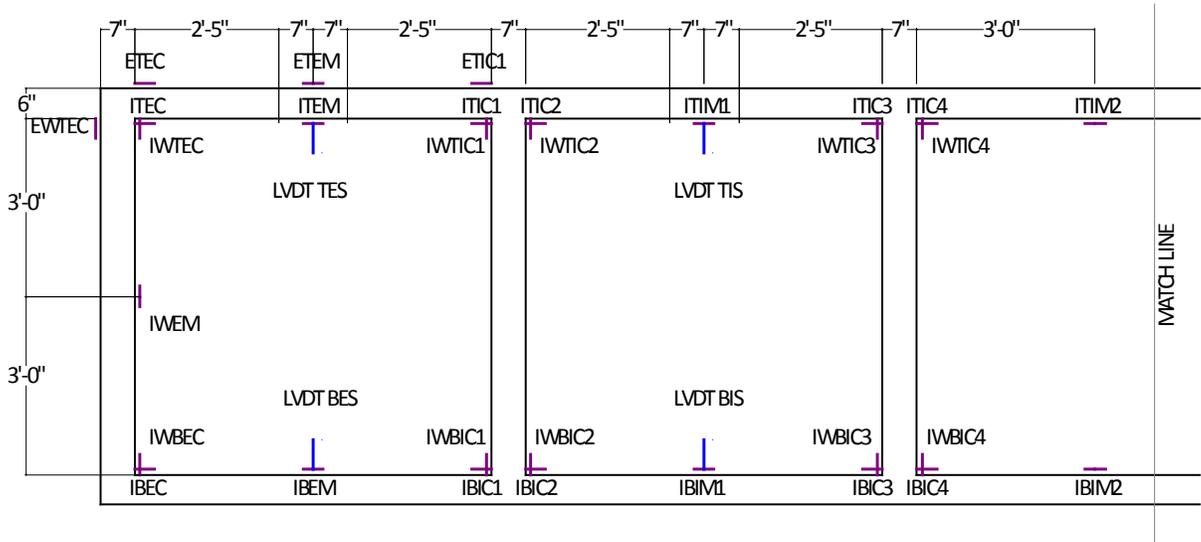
TULIA INSTRUMENTATION PLAN.
